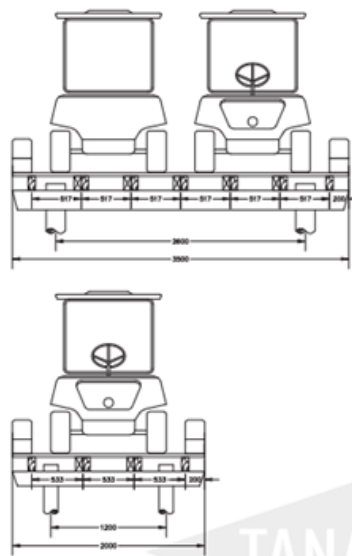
Typical boardwalk sections for 2-way and 1-way traffic
